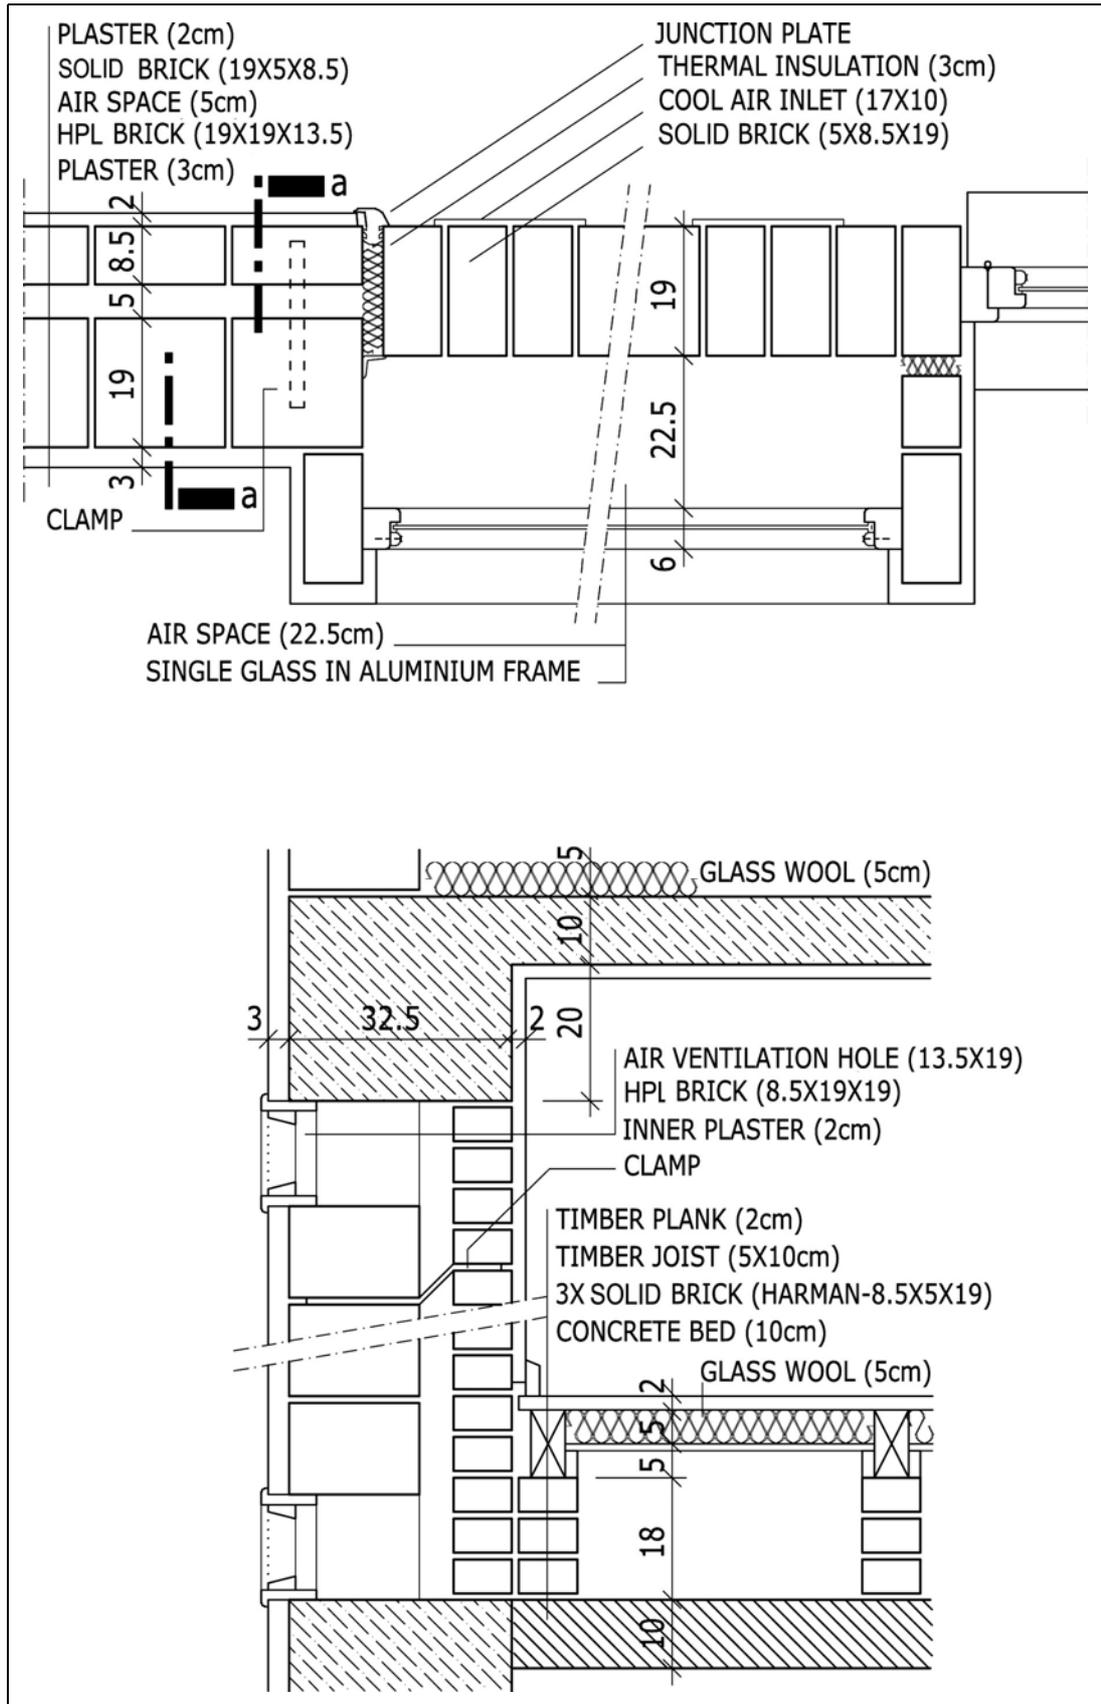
Two details specific to the sample dwelling with cavity walls: plan of the Trombe Wall and the system section including the suspended ground floor, the roof floor, and the outer wall; Scale 1/10
